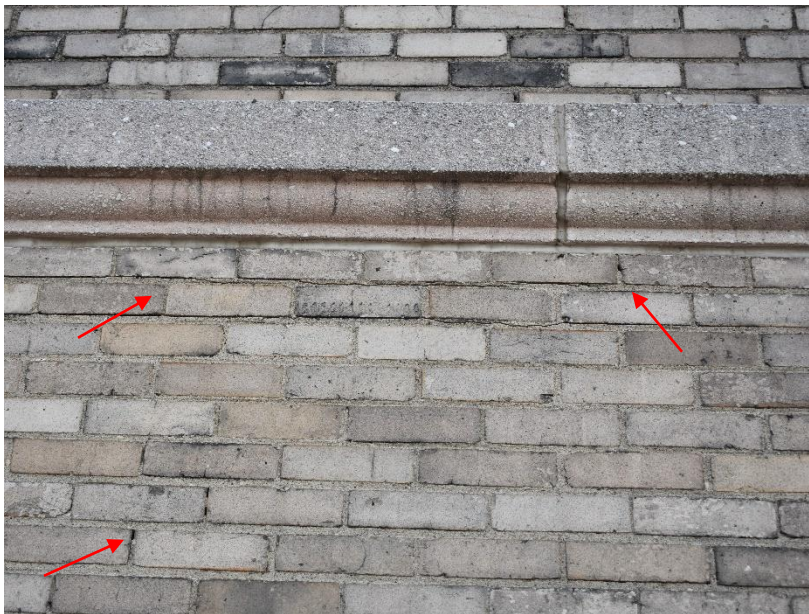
Mortar cracks in brick joints at 18 Trinity Street.
